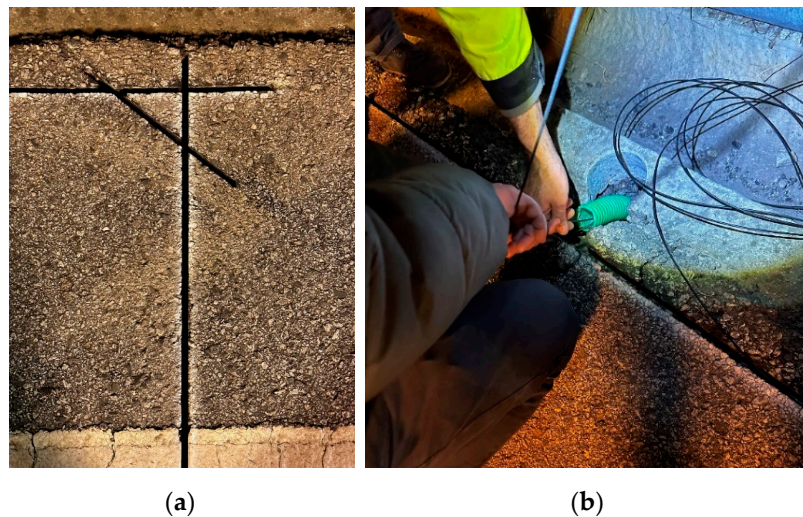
Installation details: (a) groove made on the road shoulder to protect the cables; (b) introduction of the cables on the corrugated pipe that connects to the technical cabinet.
